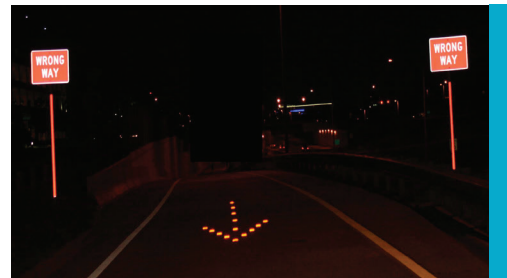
NTTA Exit Ramp with Red Retroreflective Strips on Sign Supports and Red RRPM-supplemented Wrong Way Arrow Pavement Markings (Nighttime)
